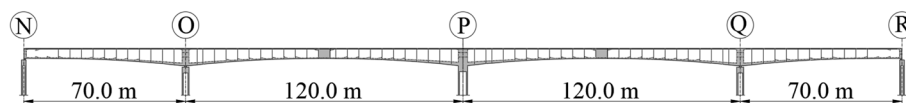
Elevation of El-Warrak Bridge over the Nile River
